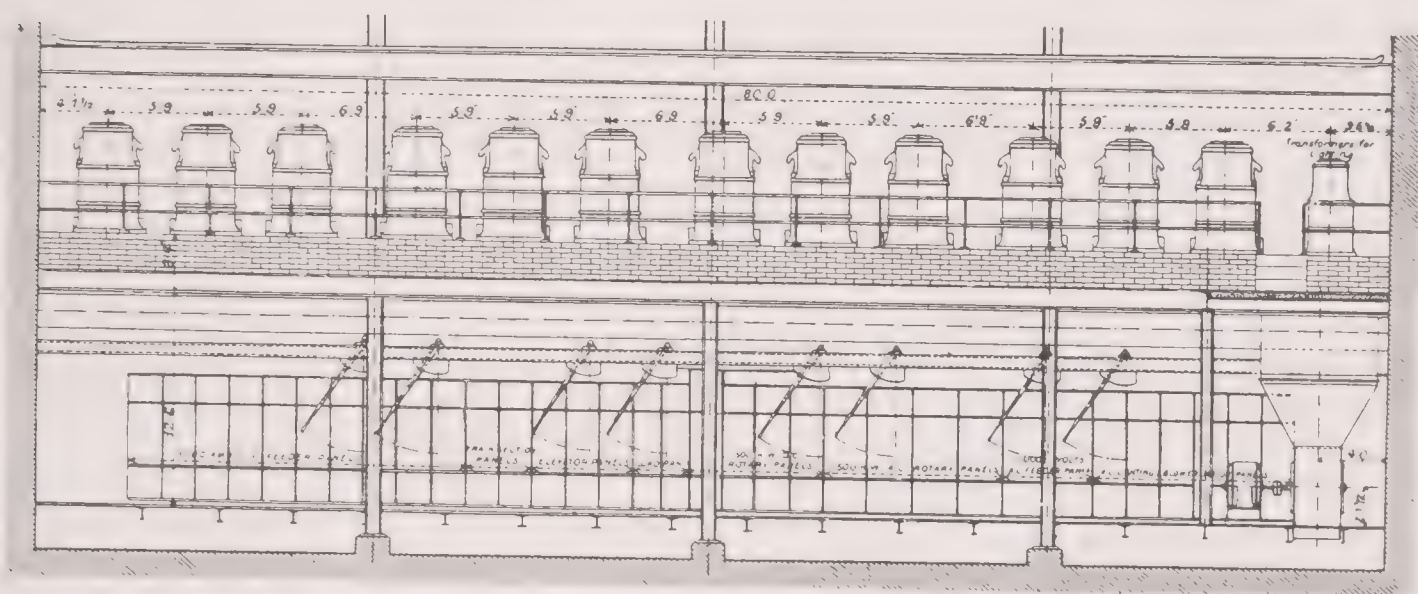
DISTRICT RAILWAY: GALLERY ELEVATION CHARING CROSS SUB-STATION.
